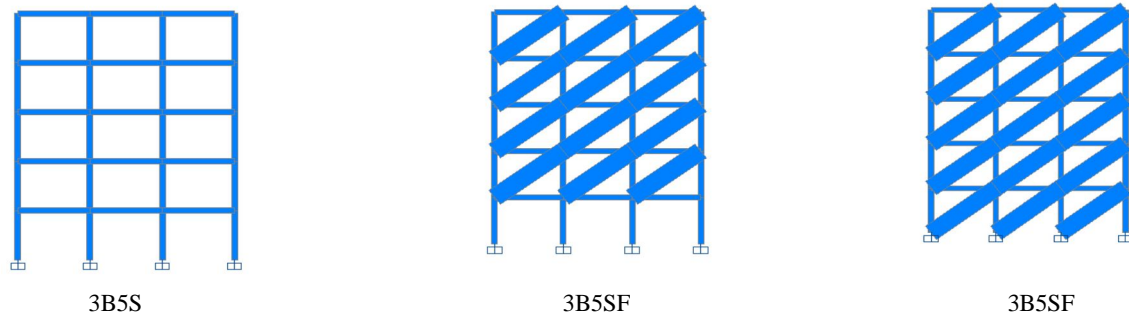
Typical RC frames with MI modelled as diagonal strut
